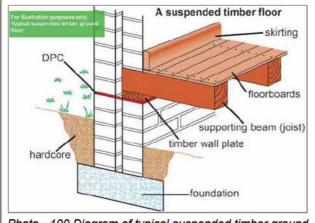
Diagram of typical suspended timber ground floor - subject property may not be to this specification
